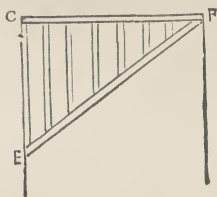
GABLE ROOF—SIDE ELEVATION.
